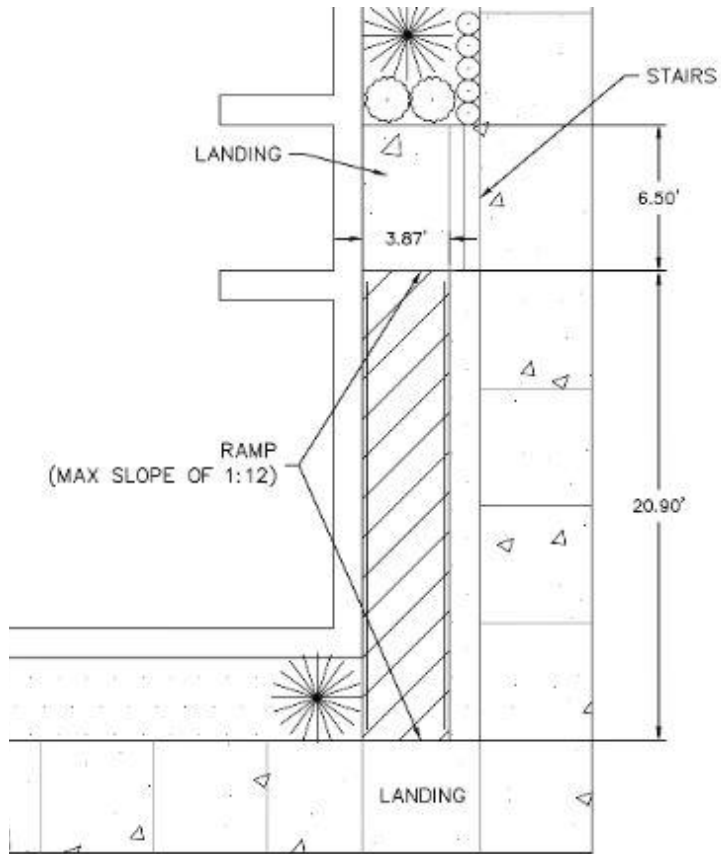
Proposed ADA accessible entrance with ramp and guardrails.
